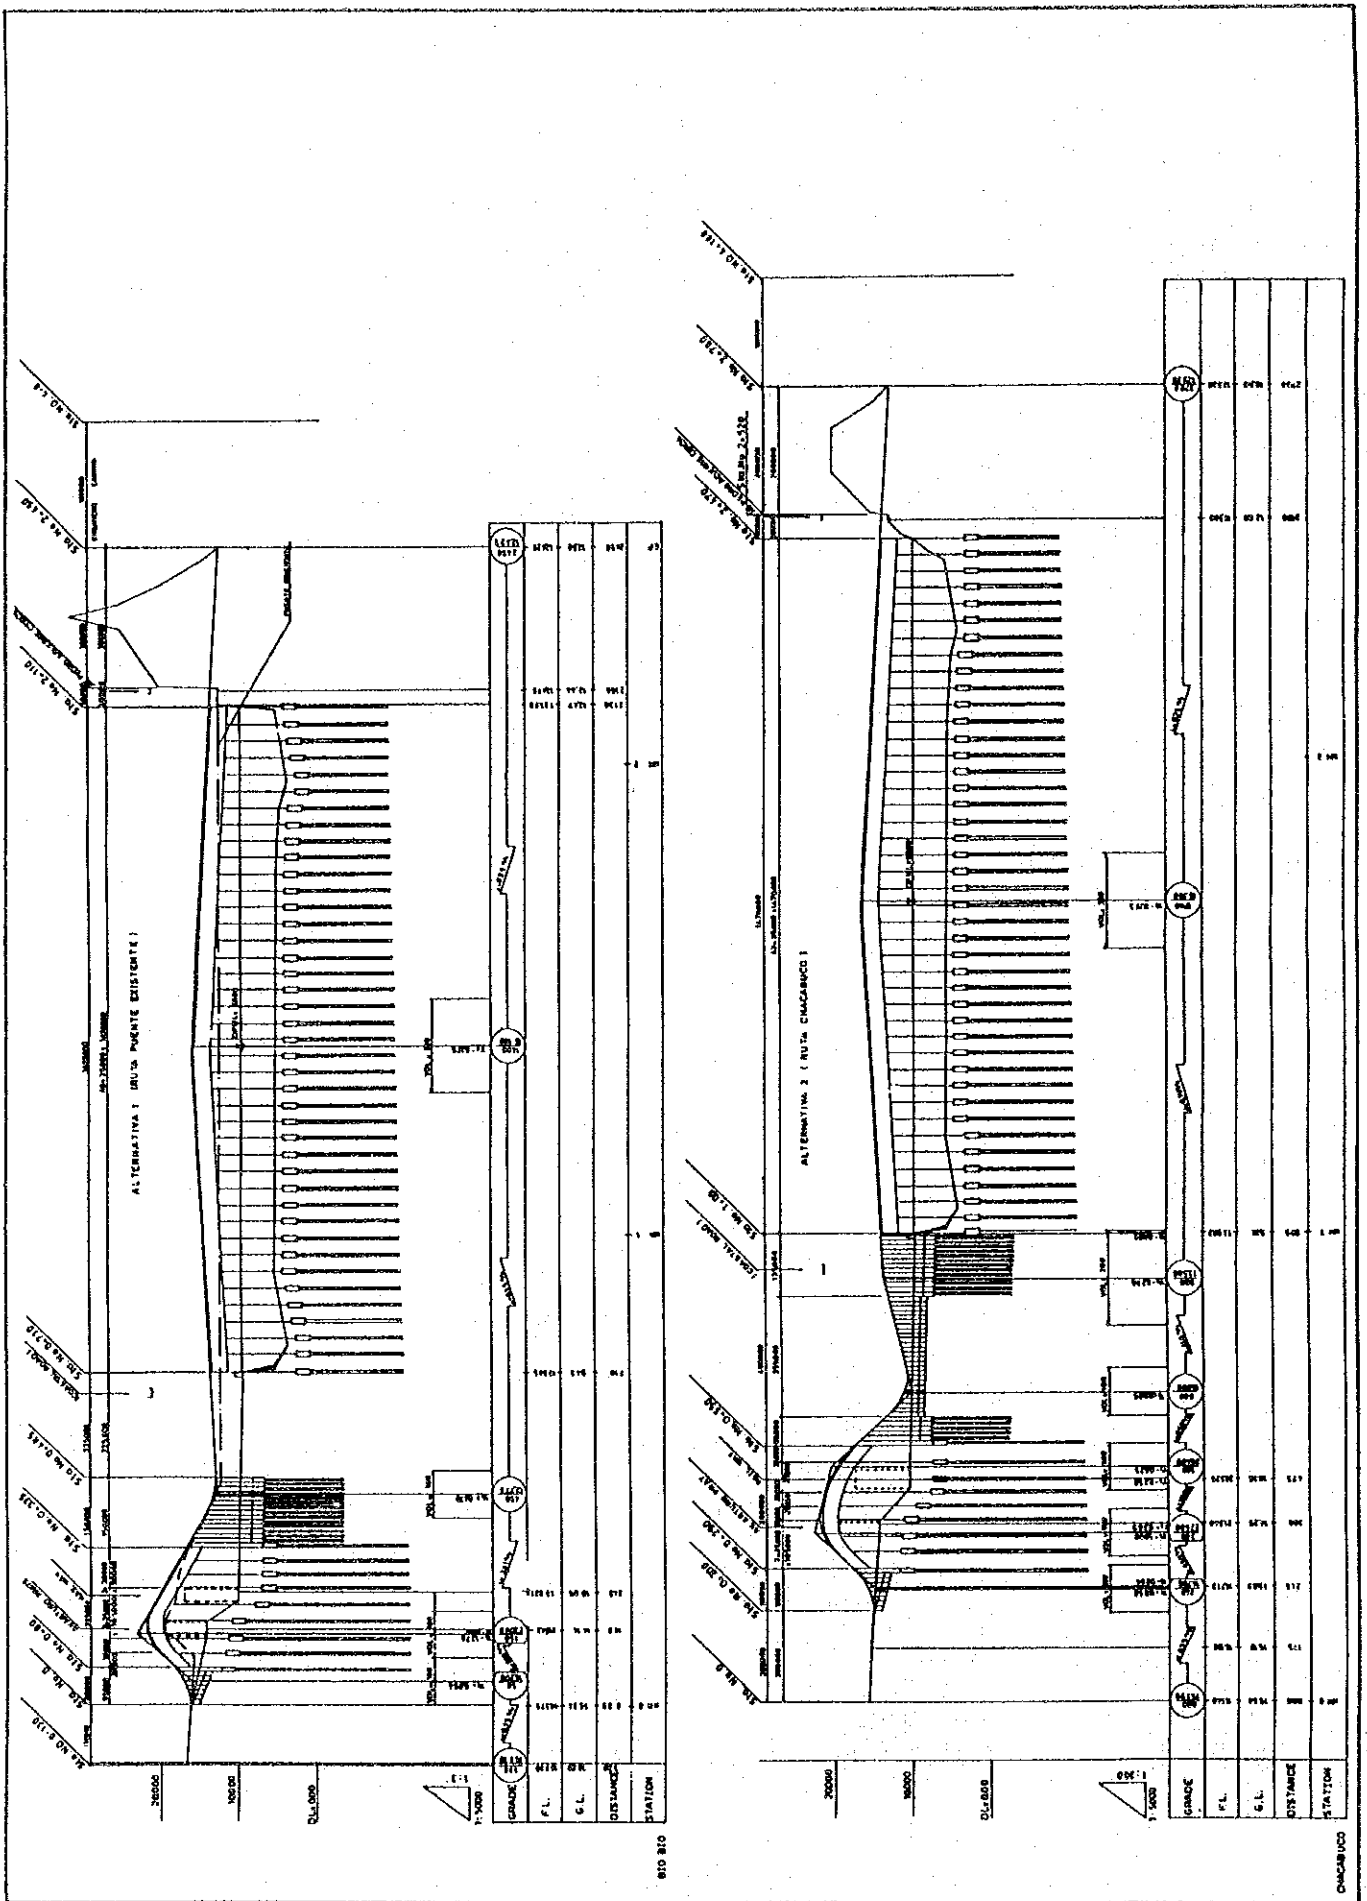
Profile of Bridges for Alternative 1 and 2
